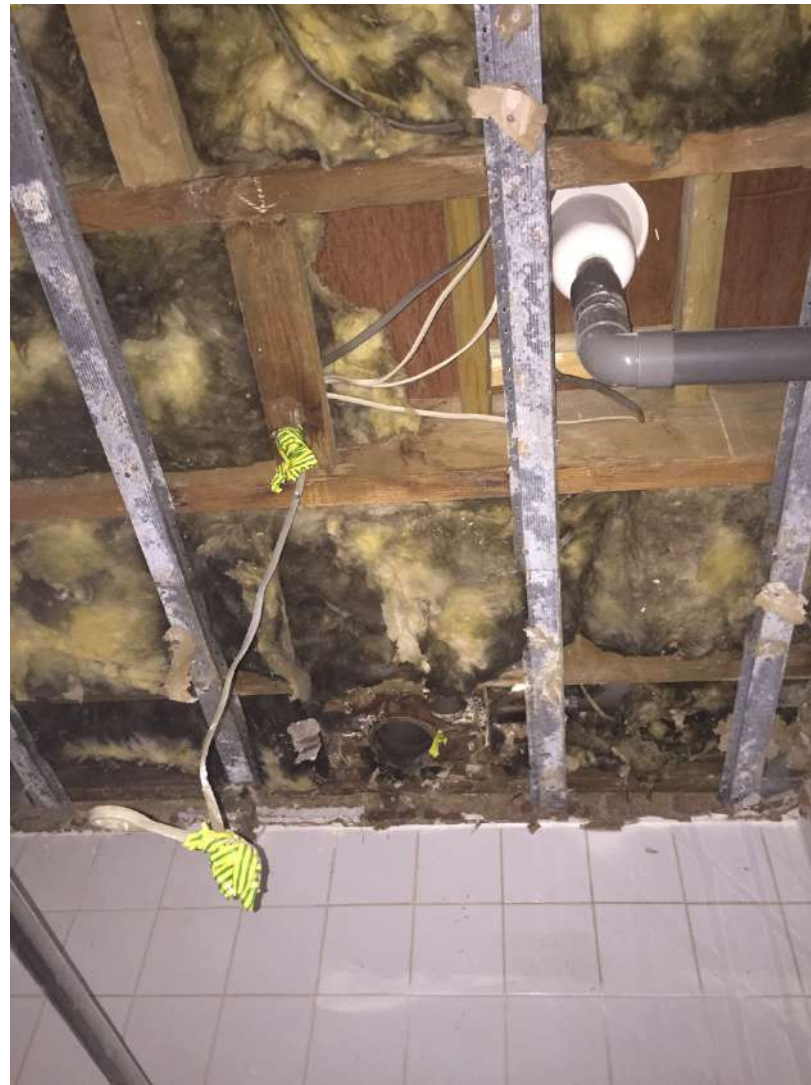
A picture of some areas of ceiling that require repairs (not original and are for information only).
